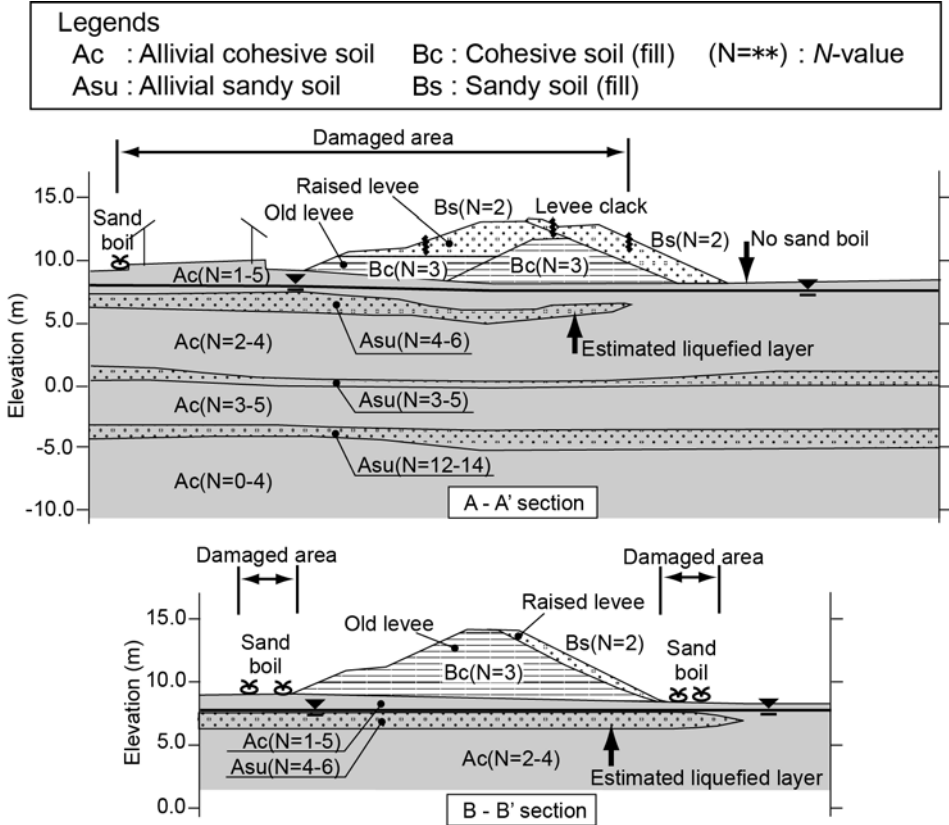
Presumed cross-section of damaged area (Shimonomyou-district, Shibata-cho)³¹⁾
